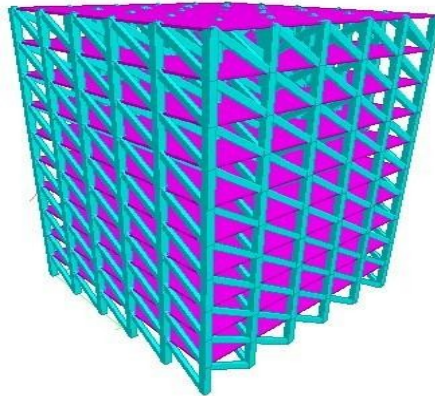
Isometric view of flat slab building having 80 % infill wall
